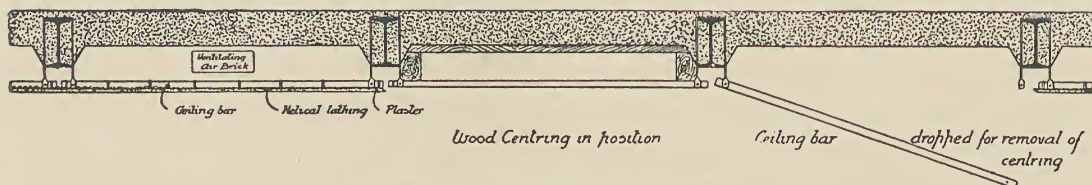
A.—Section of Banks's Fire-resisting Floor.
